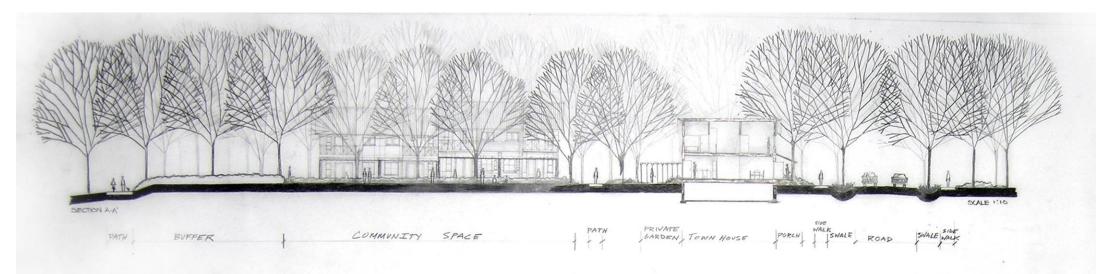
Drumlin Concept; Section through community open space, private garden, row housing and streetscape.
